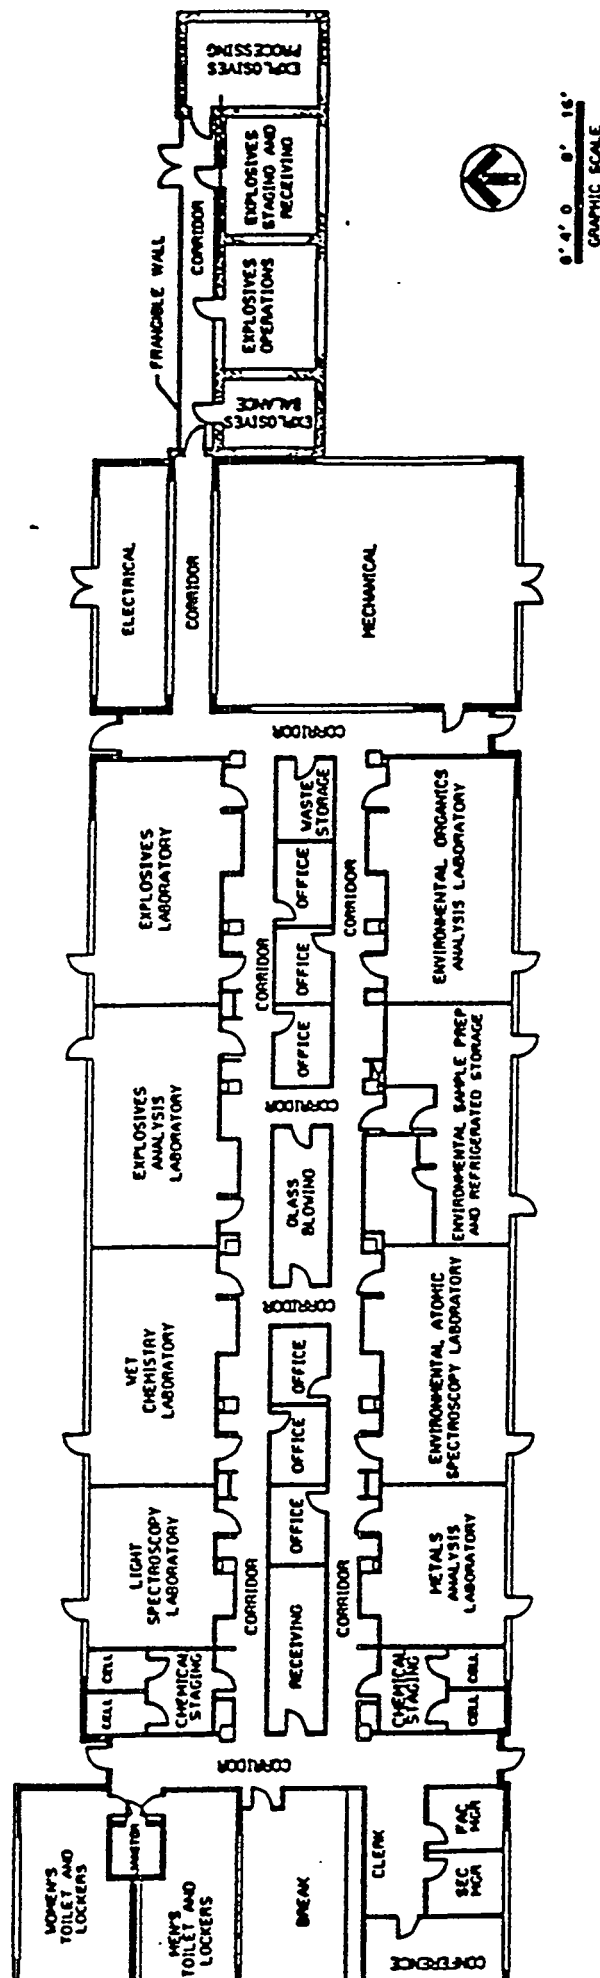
Floor Plan for Proposed ES&H Analytical Laboratory
